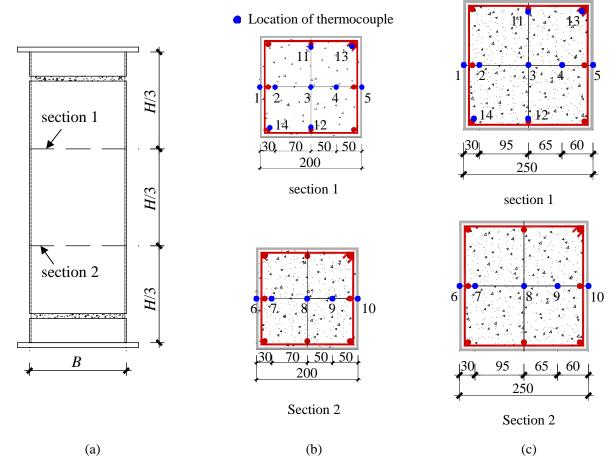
Layouts of thermocouples: (a) elevation; (b) S200-45min/90min; and (c) S250-45min/90min (unit: mm).
